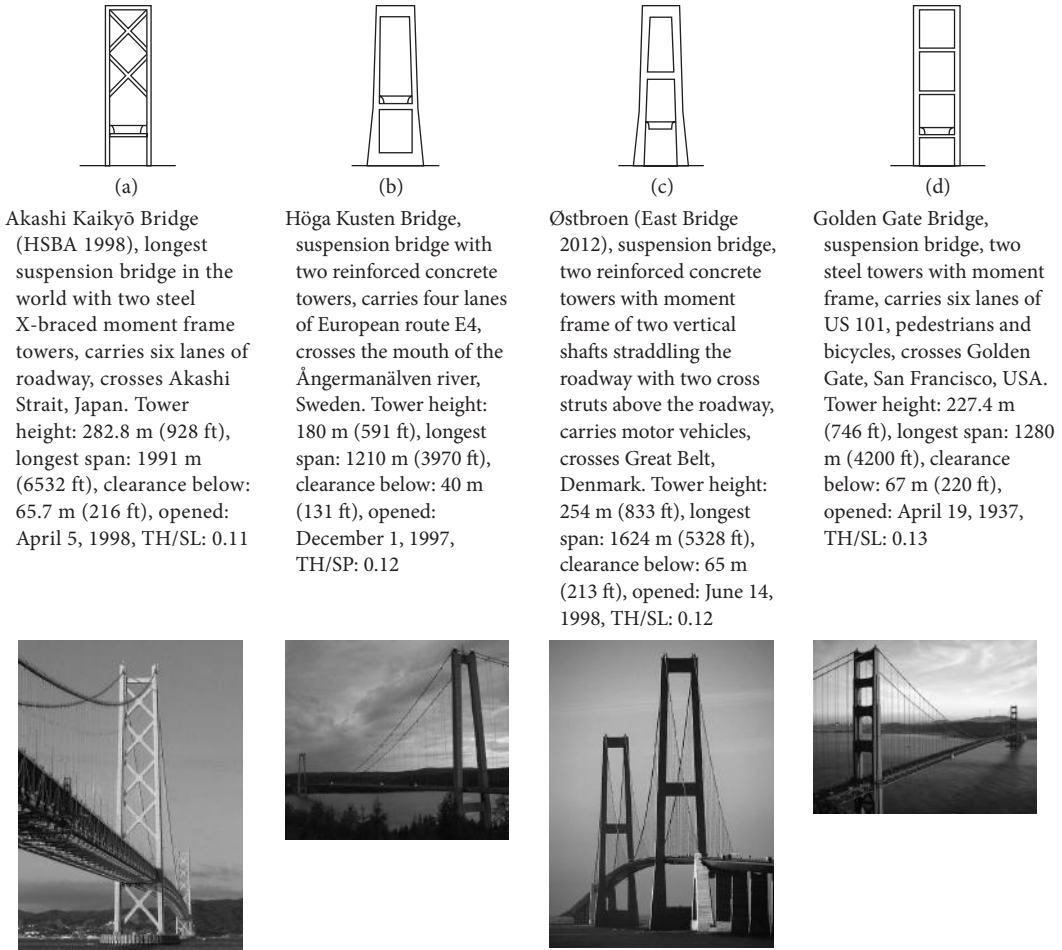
Generic forms and typical examples of towers for suspension bridges.
